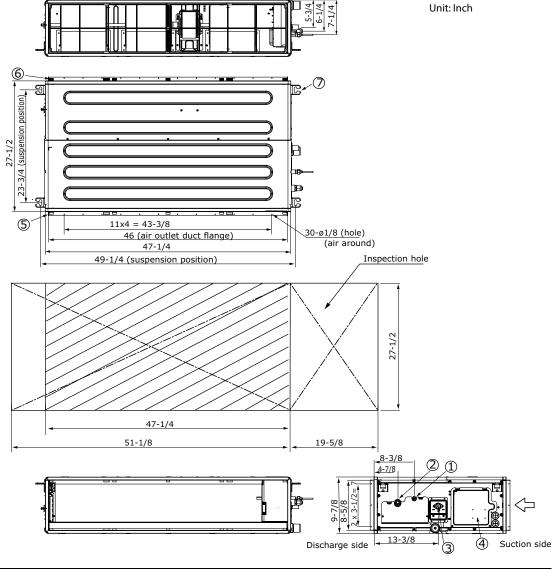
Unit dimensions: 4TVD0024/0027/0030\*\* (built-in drain pump)
